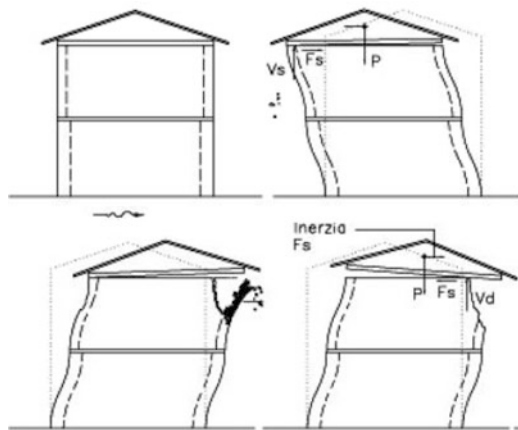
Collapse mechanism due to a reinforced concrete roof
